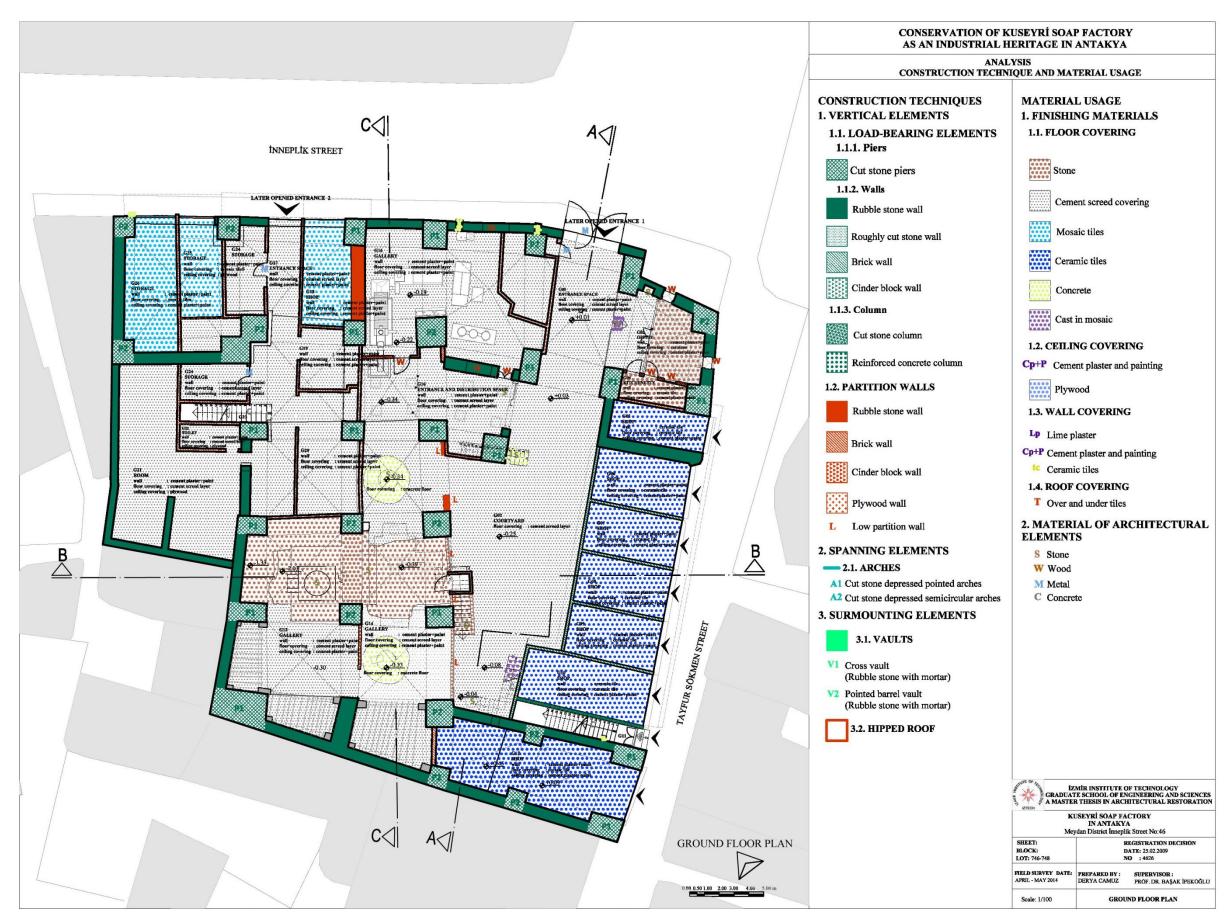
Construction technique and material usage – Ground Floor Plan
